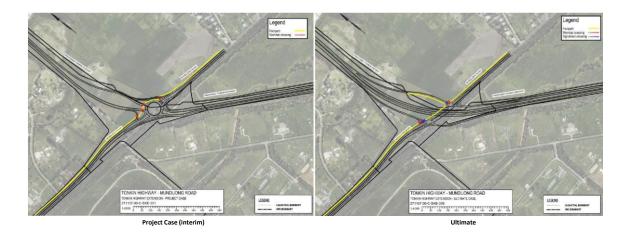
Proposed intersection concepts for the Mundijong Road/Tonkin Highway
